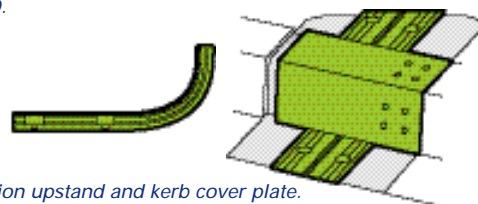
& 3: Details of the section upstand and kerb cover plate.
